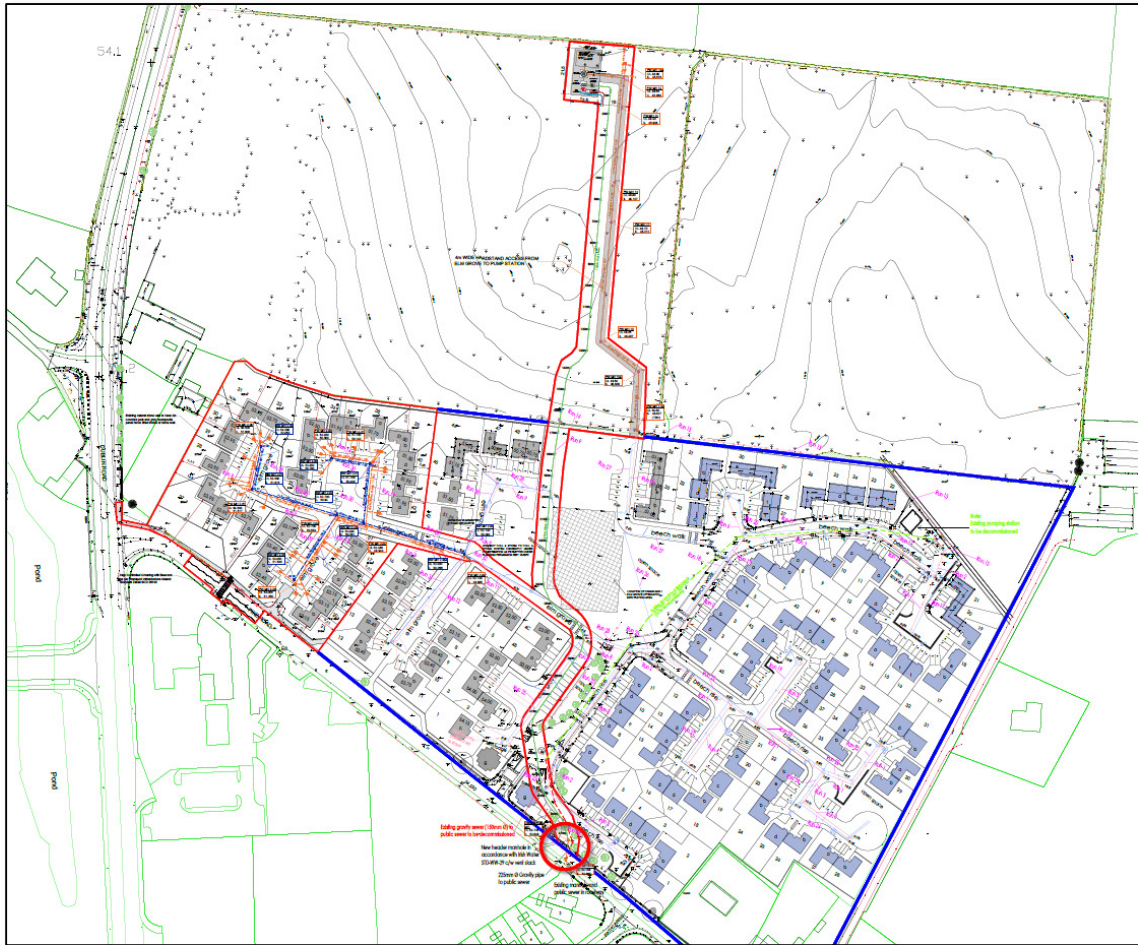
Overall Foul Layout and Connection Point (Drawing 0304)
